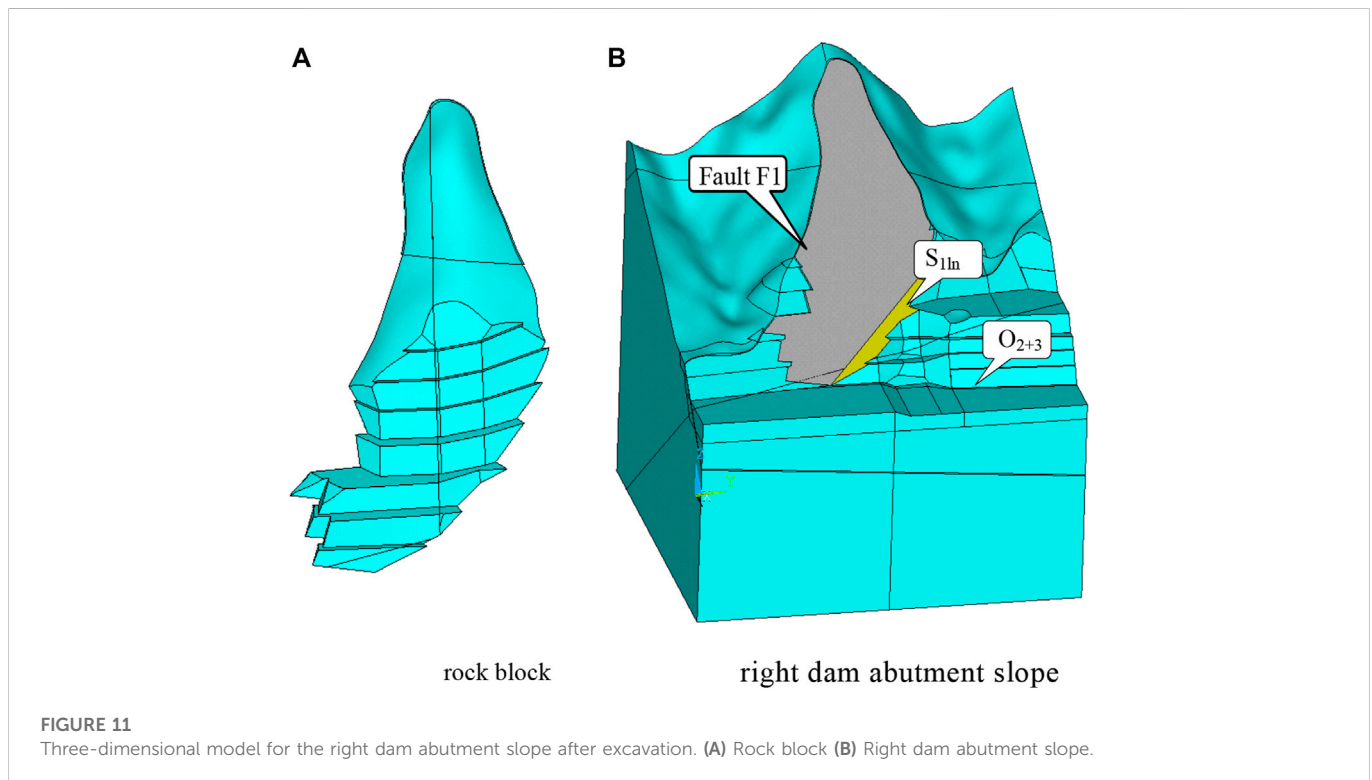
Three-dimensional model for the right dam abutment slope after excavation. (A) Rock block (B) Right dam abutment slope.
